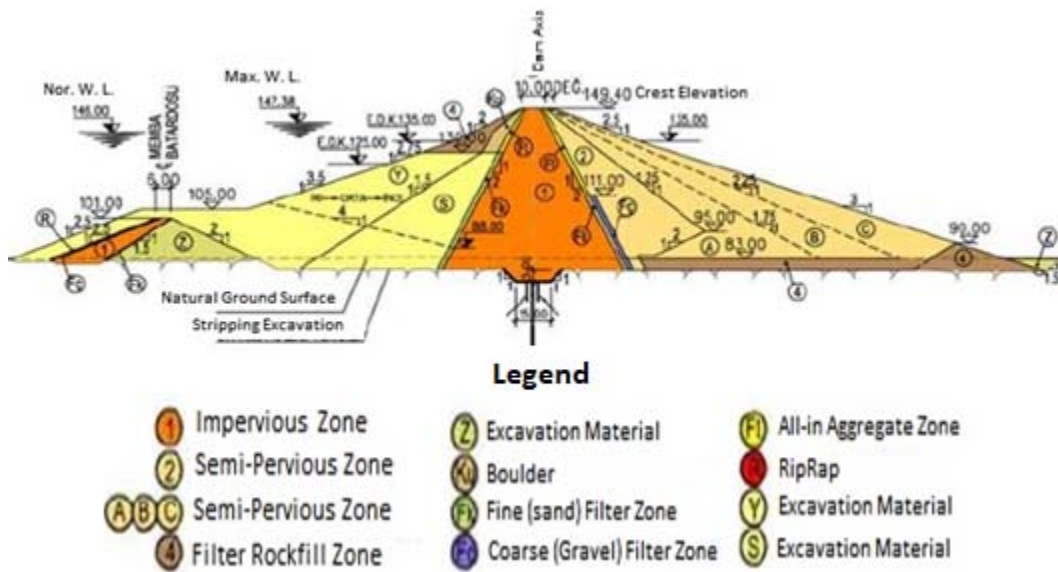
Balcova Dam typical cross-section (Courtesy of DSI)
